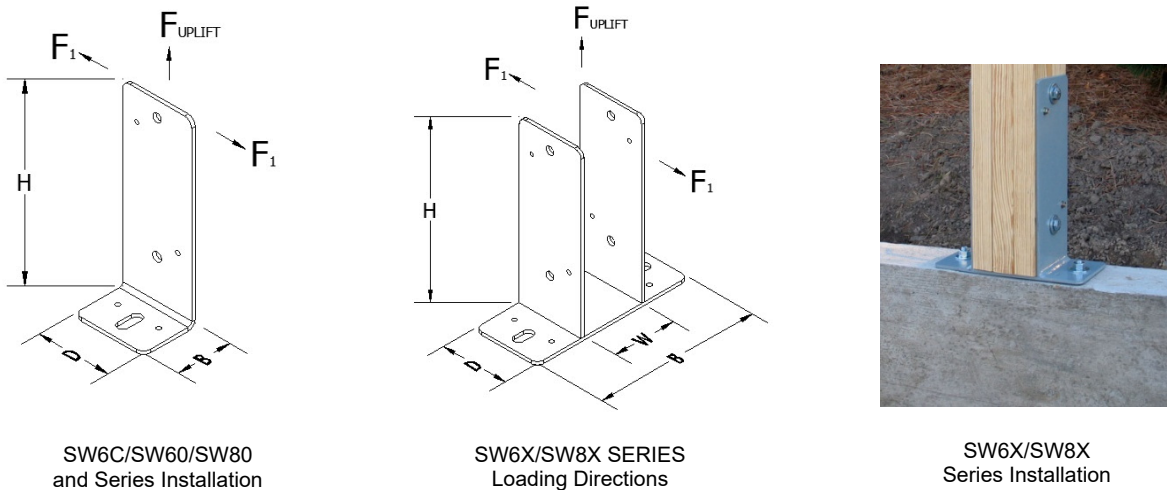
STURDI-WALL® (SW) SERIES ANCHOR BRACKET AND TYPICAL INSTALLATION
